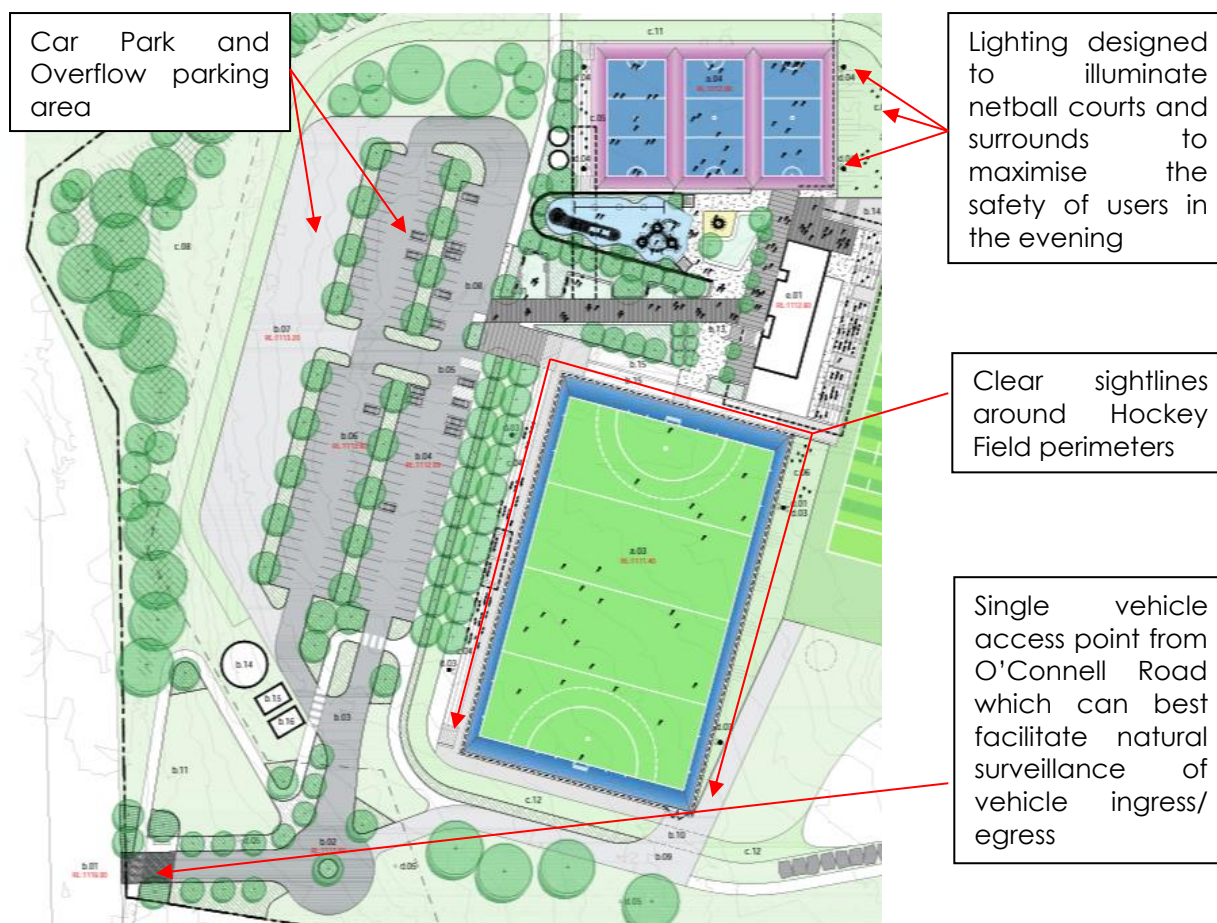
Extract from Detail Masterplan (Crawford Architects, 2021)
